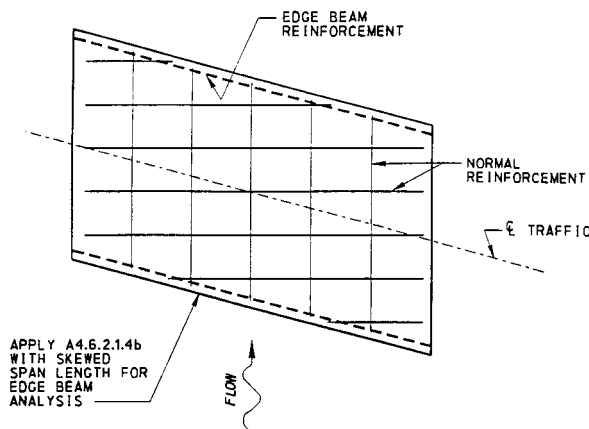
Reinforcement Requirement for Box Culvert with Skew Ends
